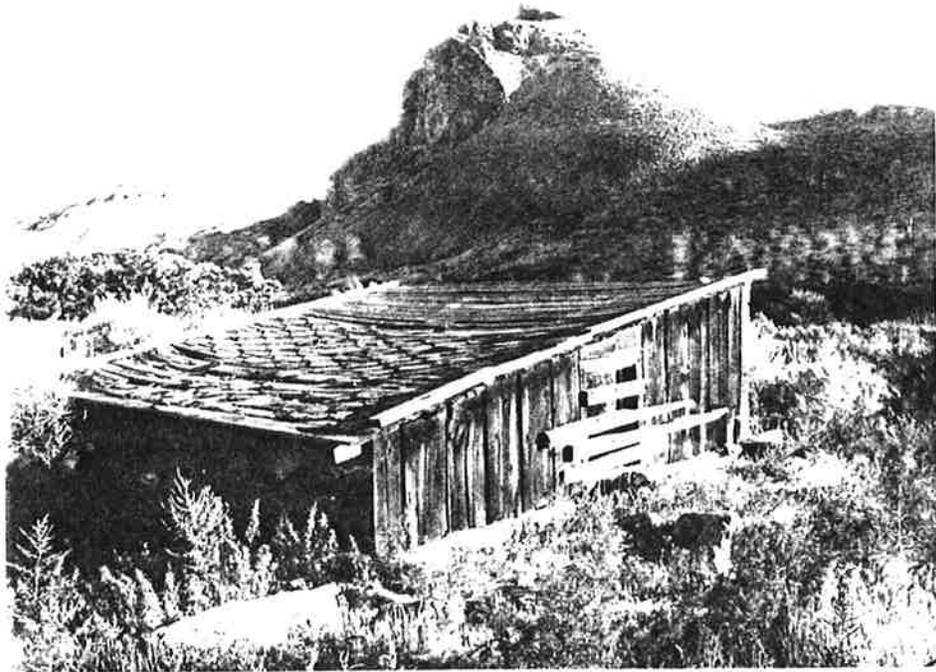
Birch Creek chicken house, west (rear) and south (side) elevations showing roof failure. (Neg. R2-18)
